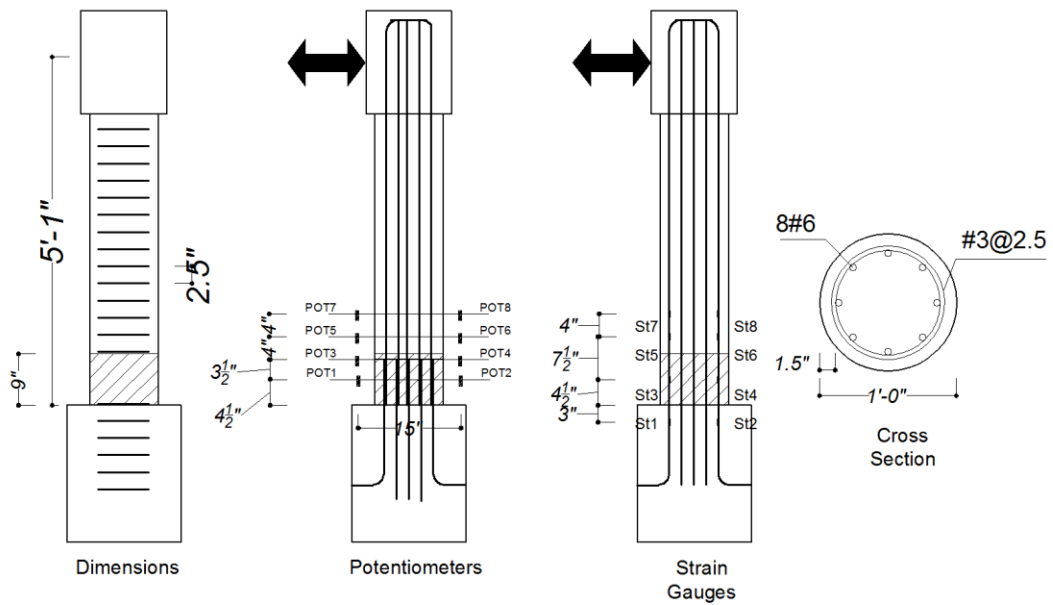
Specimen S-6-12, dimensions, reinforcement and measurement tools details (No stirrups at splice region).
